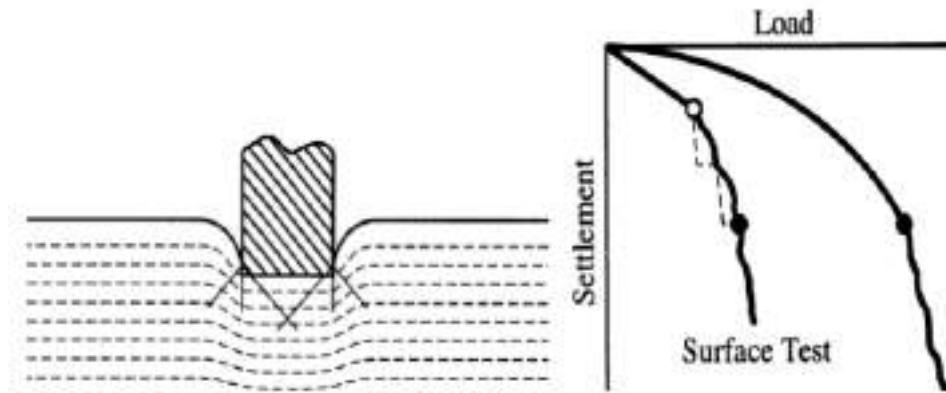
Shallow Foundation Bearing Capacity Failure (Punching Shear Failure)
